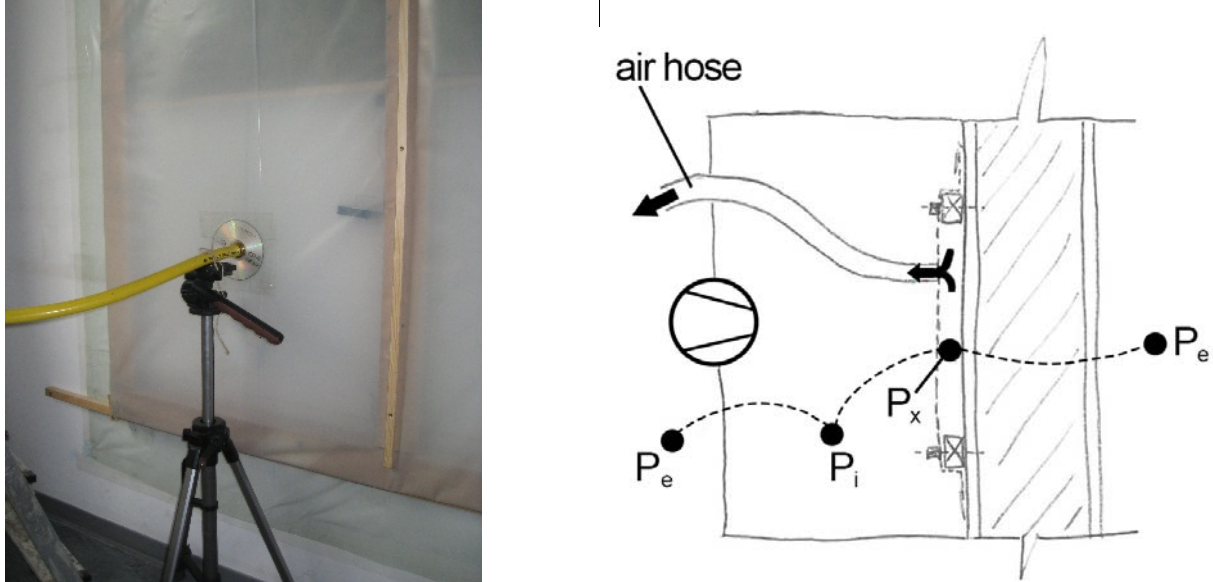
left: hose leading from facing formwork to the outside; right: schematic depiction of the test set-up (layout)
